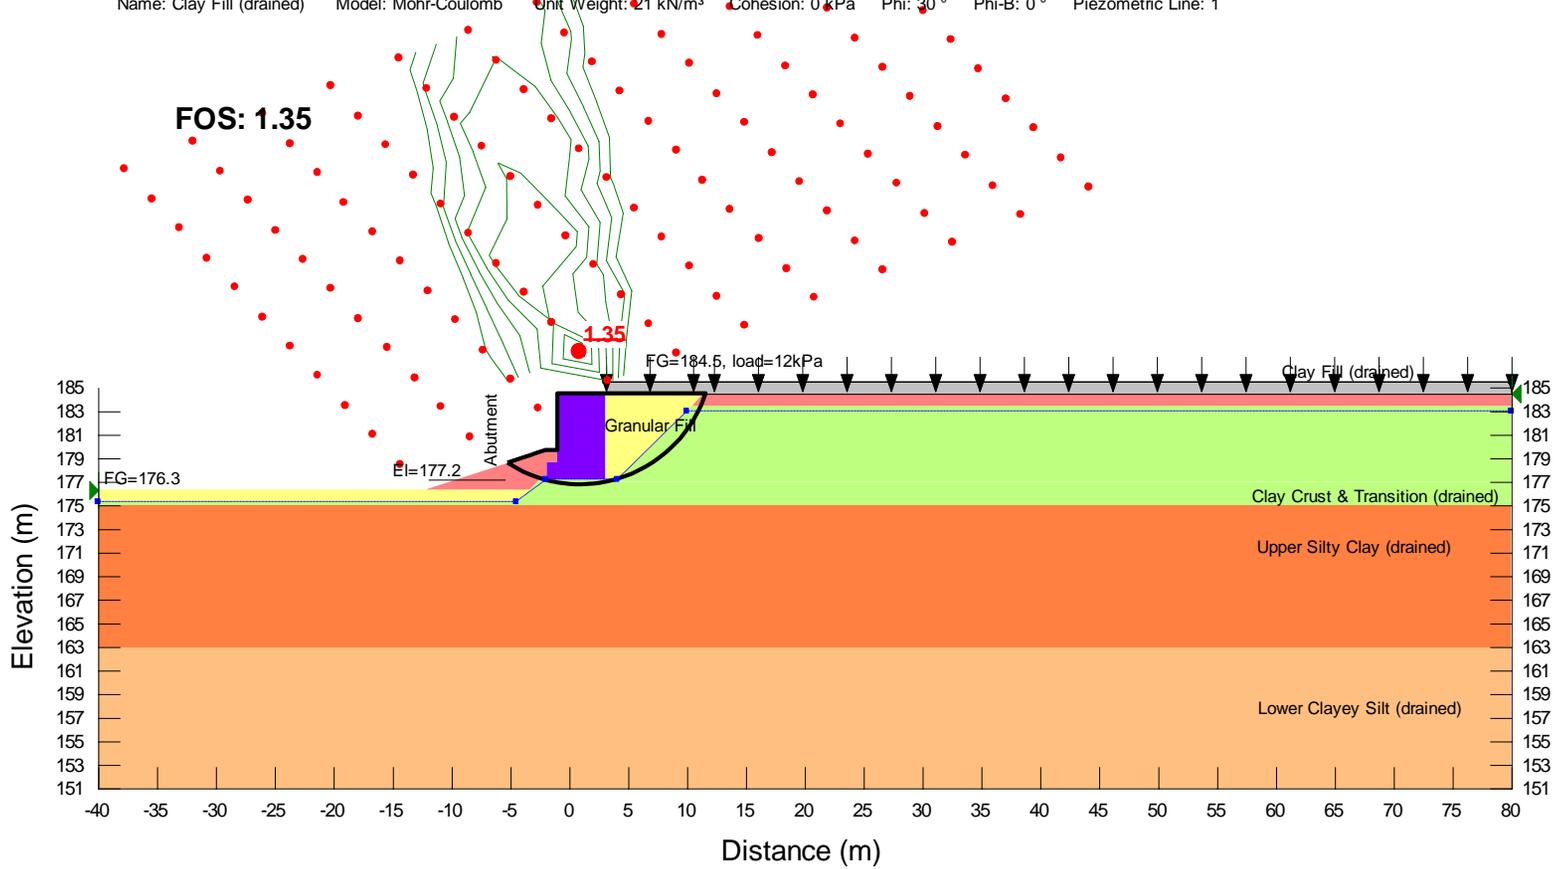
Slope Stability Result – East Abutment – Long-term Loading (Drained properties)
